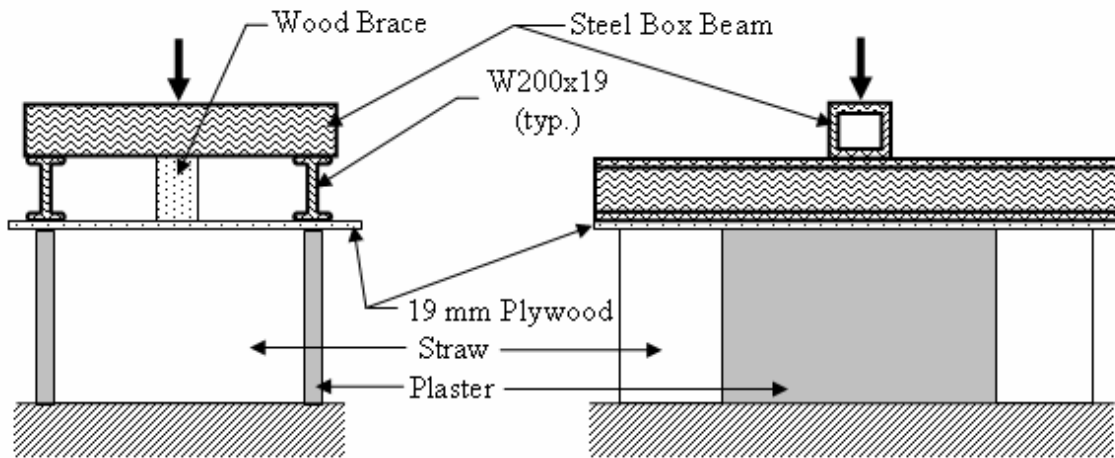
Plastered Straw Bale Compression Test Setup and Loading Plate Design
